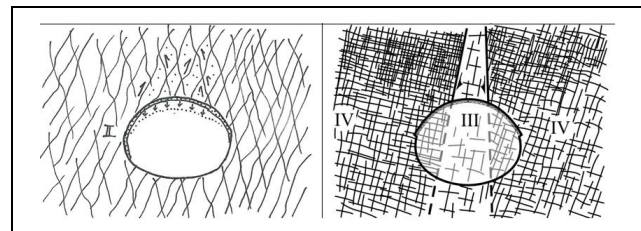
Sketches of potential 'wedge' loading on lattice girders. In the case of sufficiently low shear strength and low dilation the left-hand case could severely load the support. Resisting such a mechanism would require bolting and anchoring. In the case of the collapse illustrated in Figure 6 it was the loading from the ridge of (Bieniawski) class III rock, which was preserved as a 10 to 11m high ridge above the cavern centre-line. The potential for such a ridge is shown in Figure 8b, i.e. ridges that are still concealed by soil and sand.
